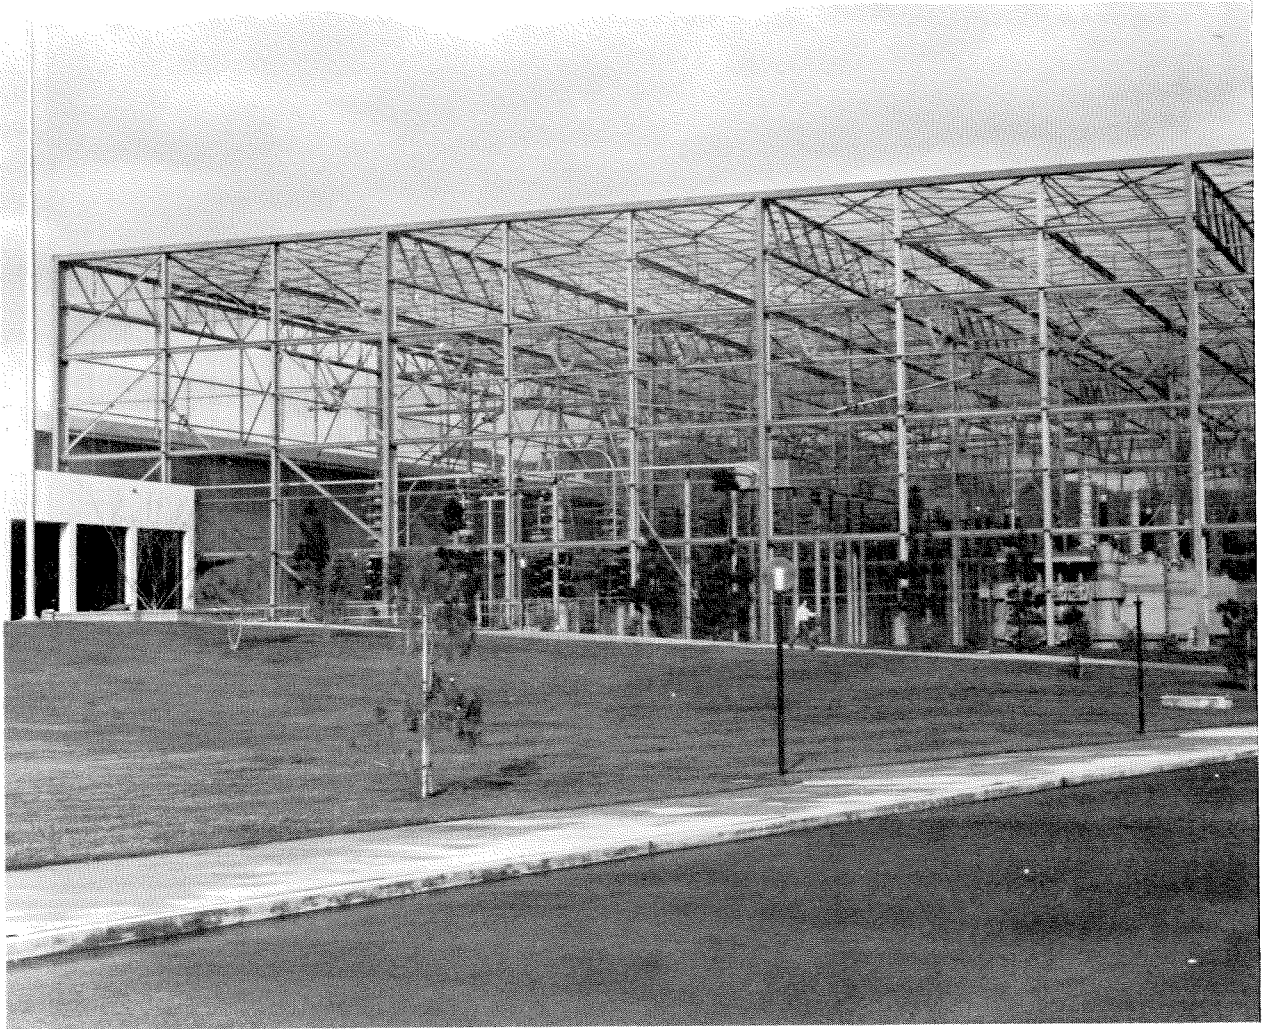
3 "Birdcage" on east side of Sylmar Converter Station. The crossbracing of the cage was damaged and some of the equipment suspended from the roof of the cage was damaged.
